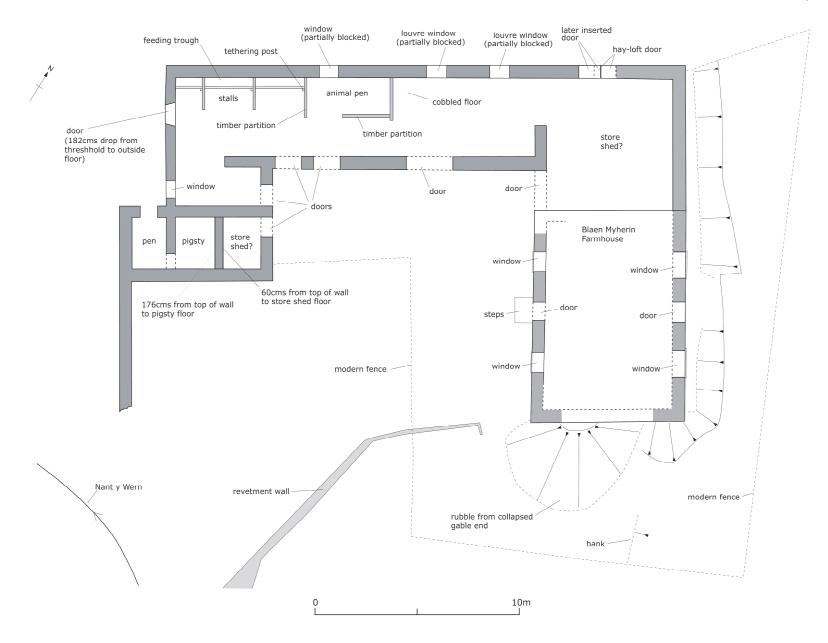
Plan of Blaen Myherin Farm showing building layout and details referred to in text.
